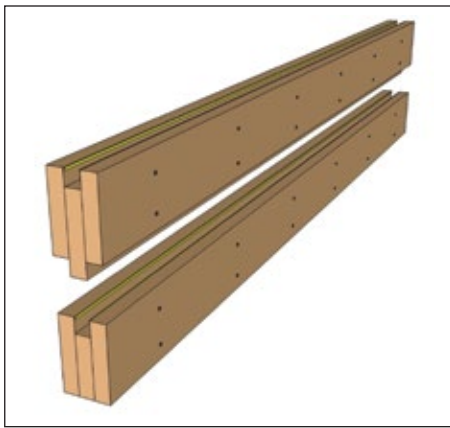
Adhesive placement between 2 × 8 beams in nail laminated wall.
